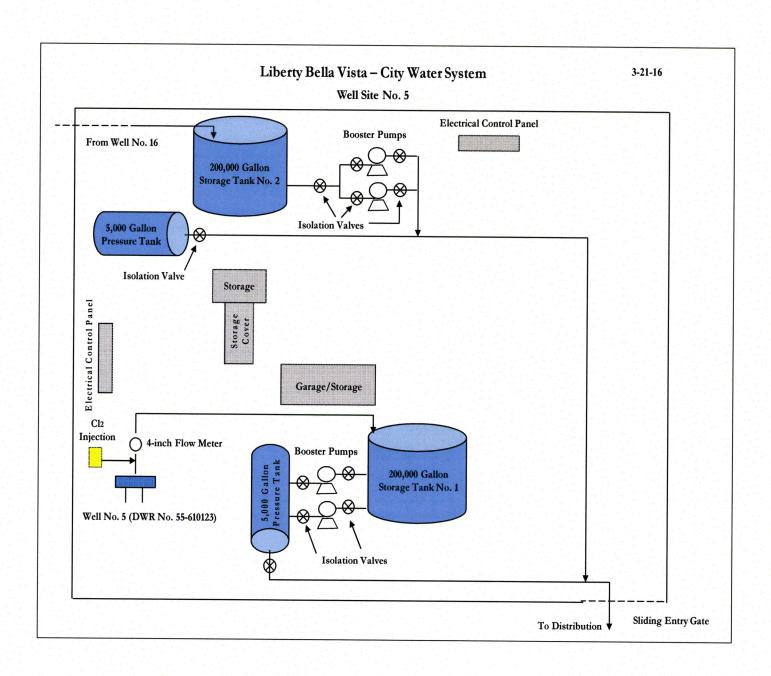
CITY WATER SYSTEM WELL SITE NO. 5
